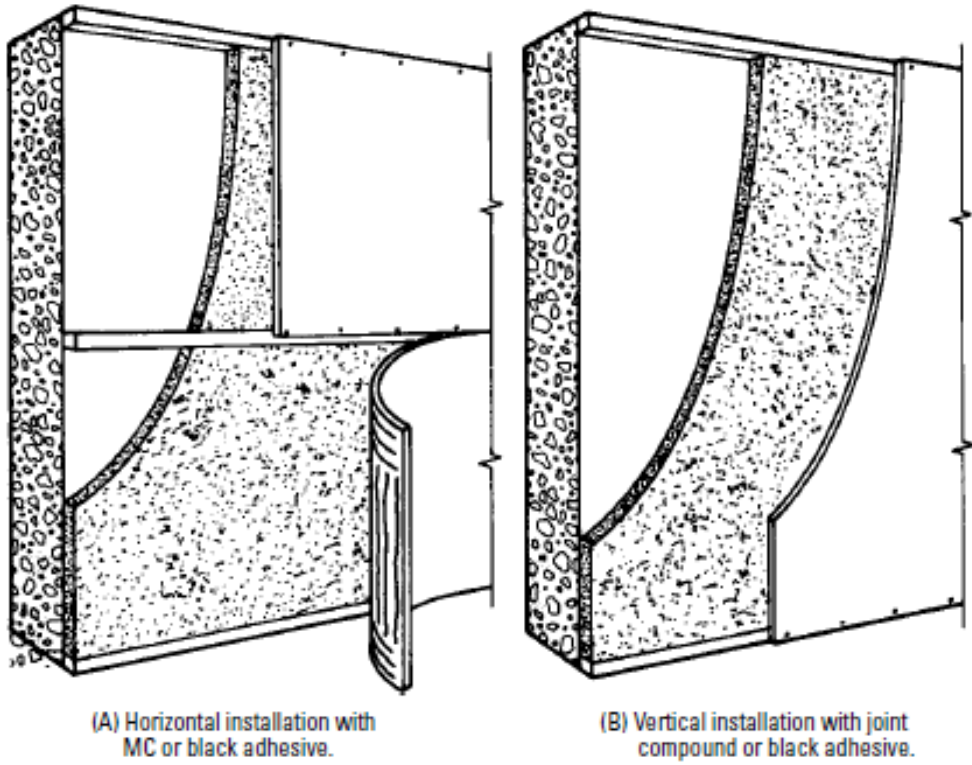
Plasterboard may be installed against foam insulation with adhesive.
